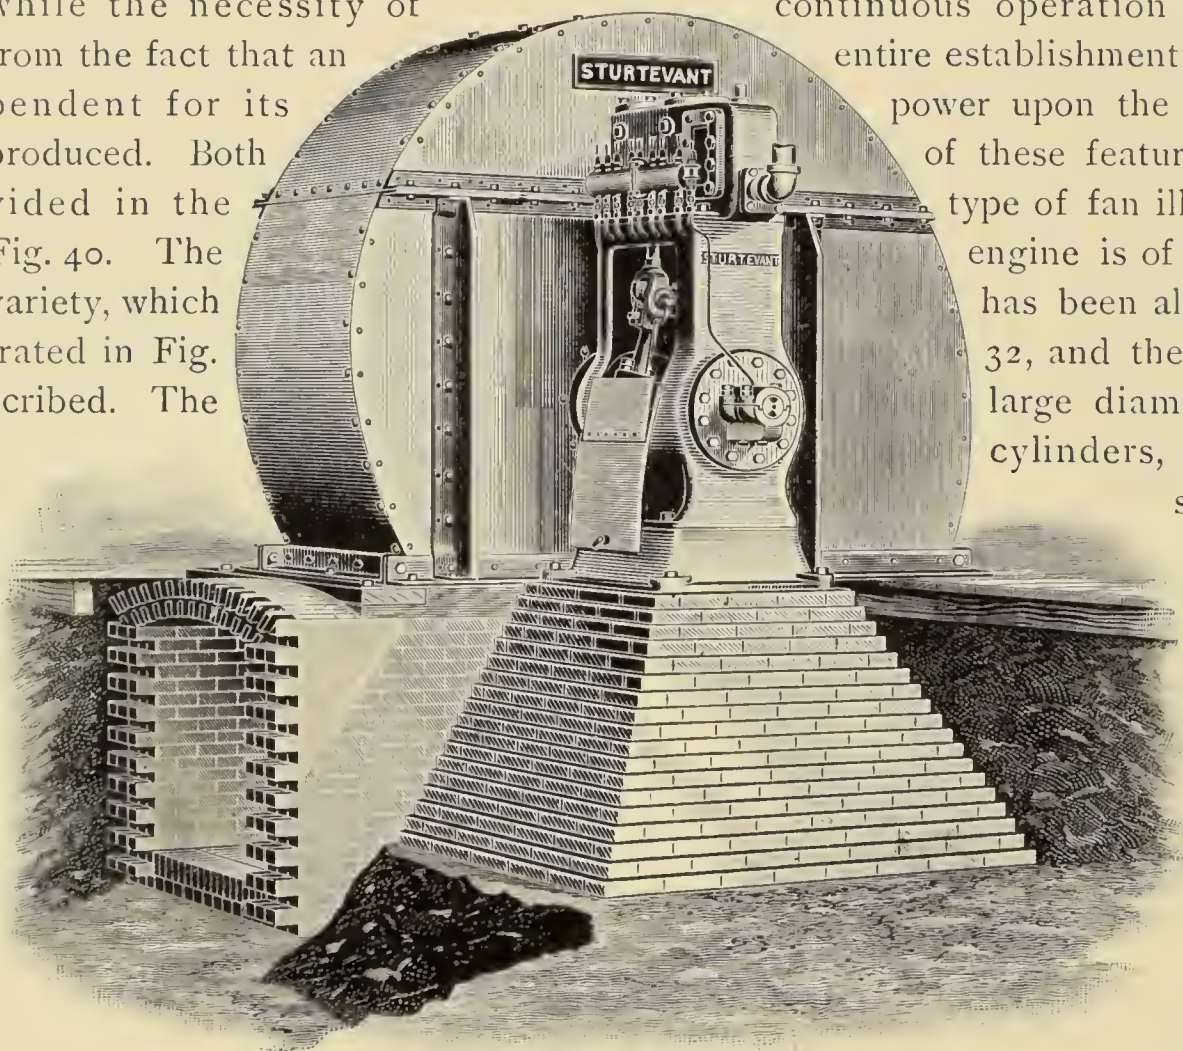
STEEL-PLATE STEAM FAN WITH THREE-QUARTER HOUSING AND DOUBLE UPRIGHT ENGINE.
